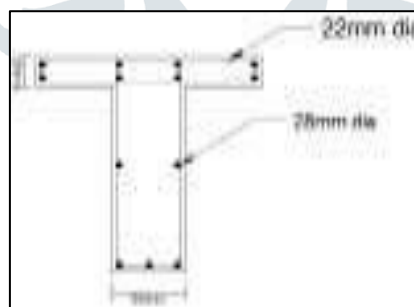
Reinforcement Details for Intermediate Longitudinal Girder
